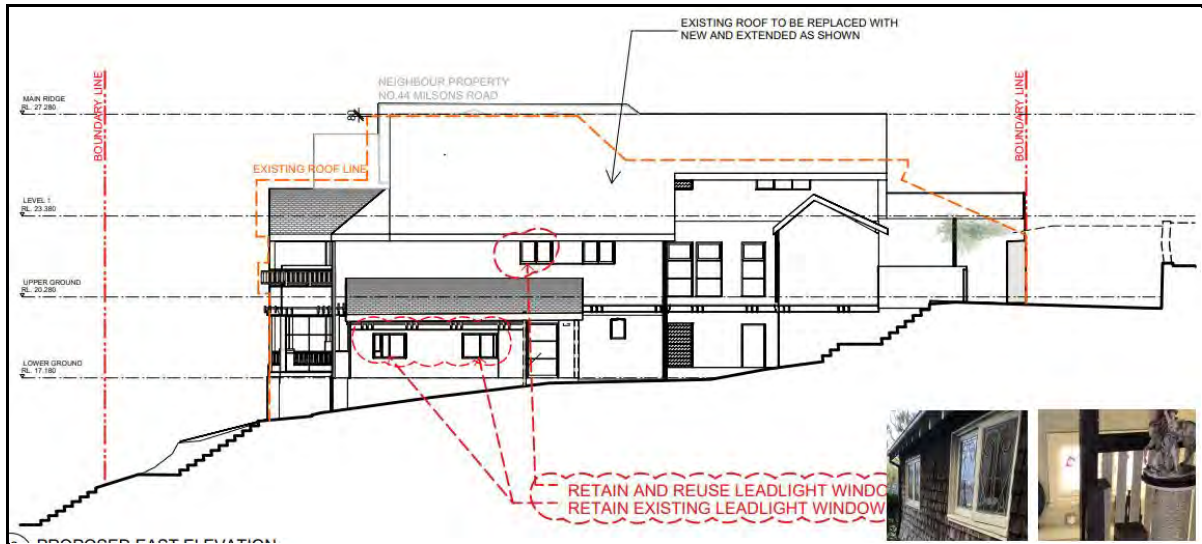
Proposed East Elevation, DA-A-203 Rev L
